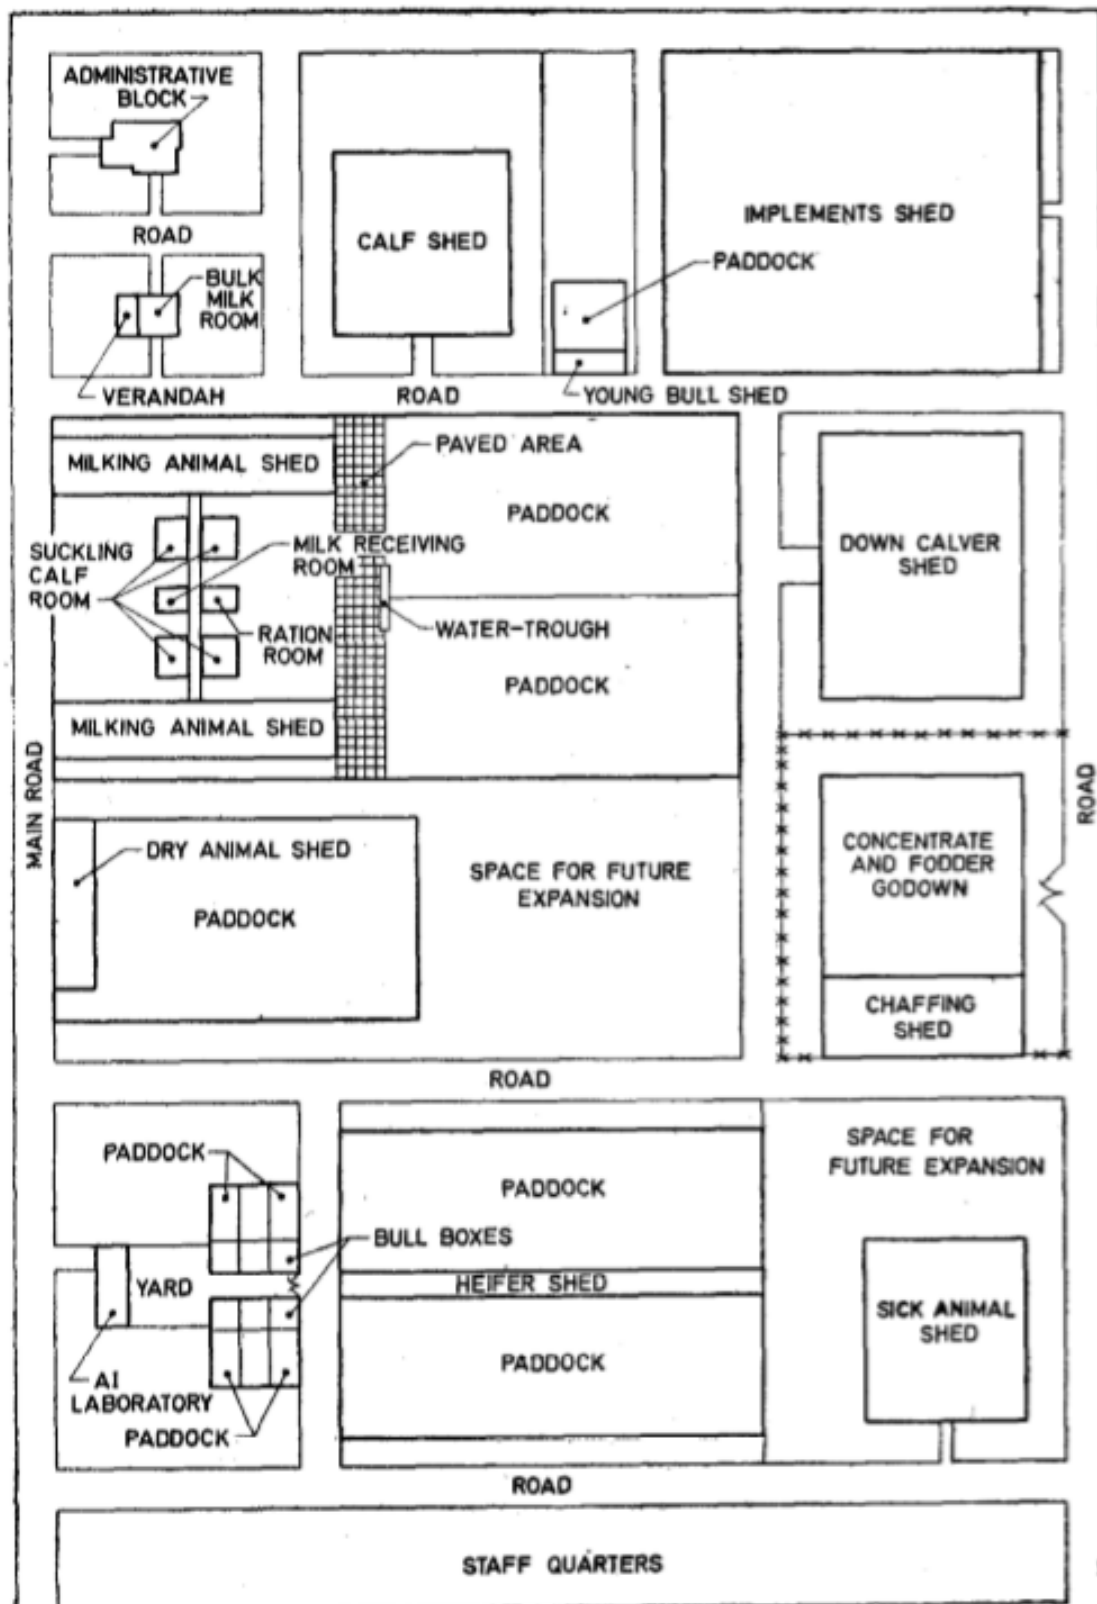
B LAYOUT PLAN FOR LARGE DAIRY FARMS
